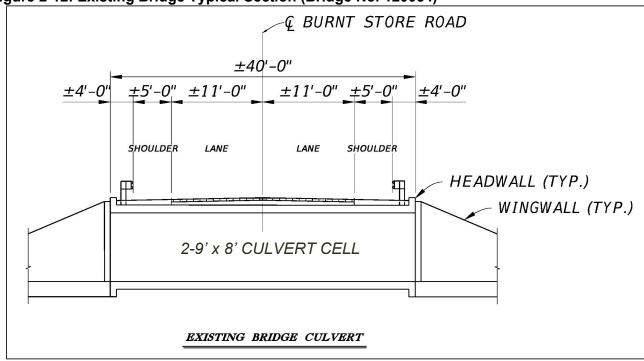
Existing Bridge Typical Section (Bridge No. 120054)
